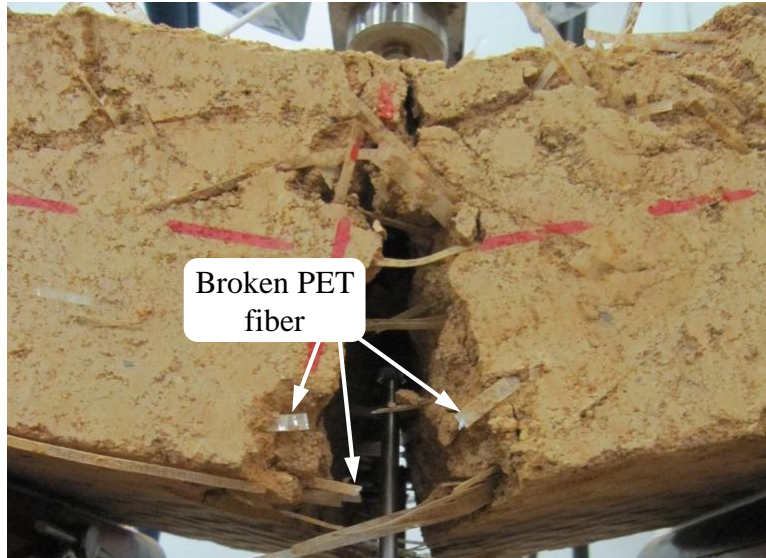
Failure details for CSREBs: fibers bridging the crack with a detail of a broken fiber.
